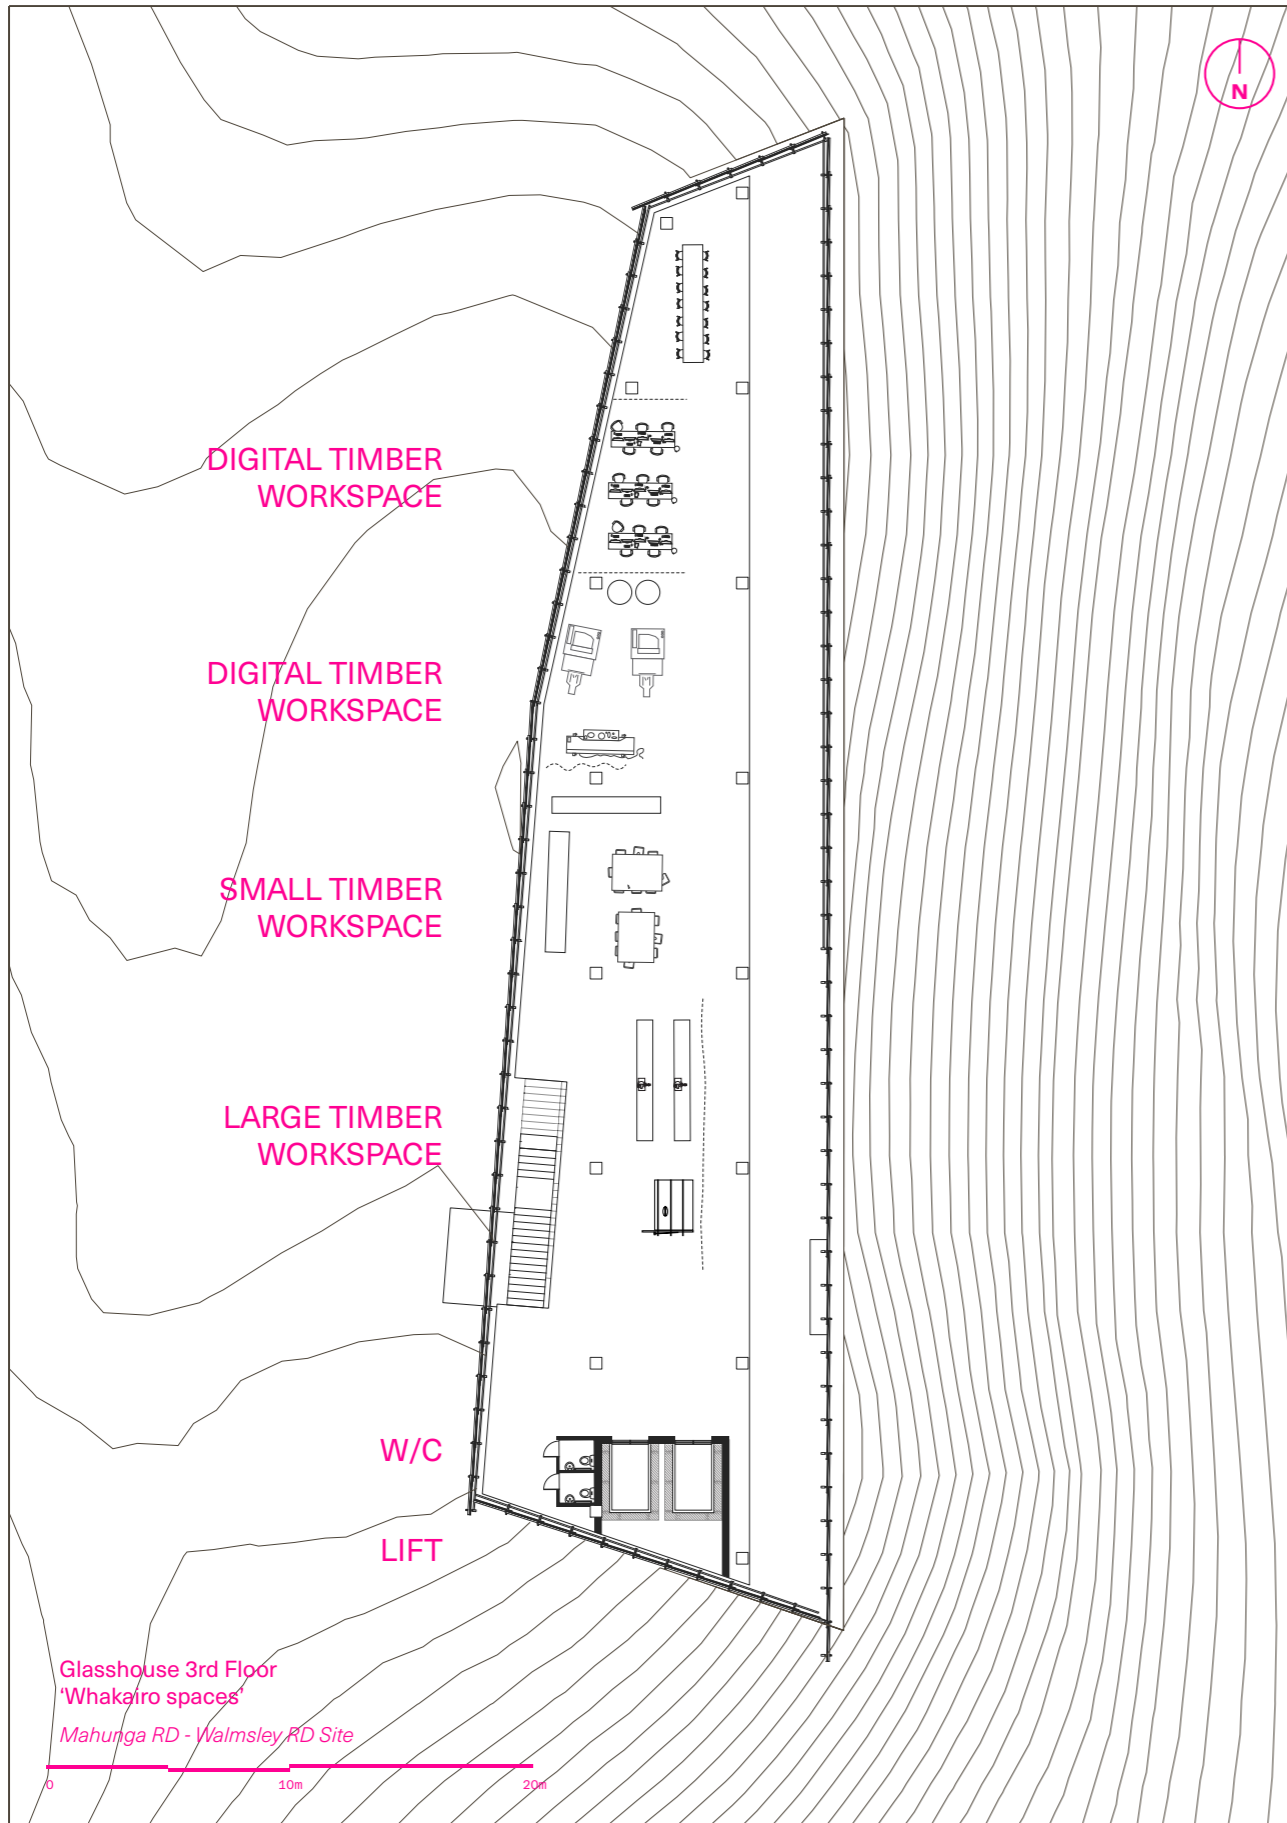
Glasshouse 3rd floor plan (Webster, 2025).
